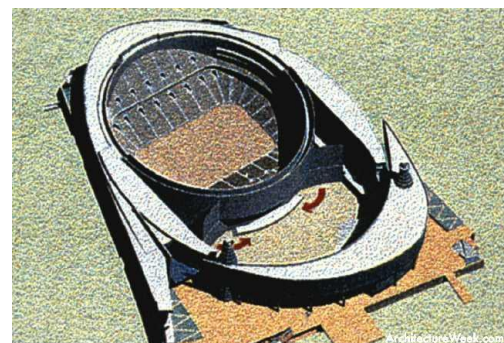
The Roof structure can be placed 66 meters above ground level (URL 05)
